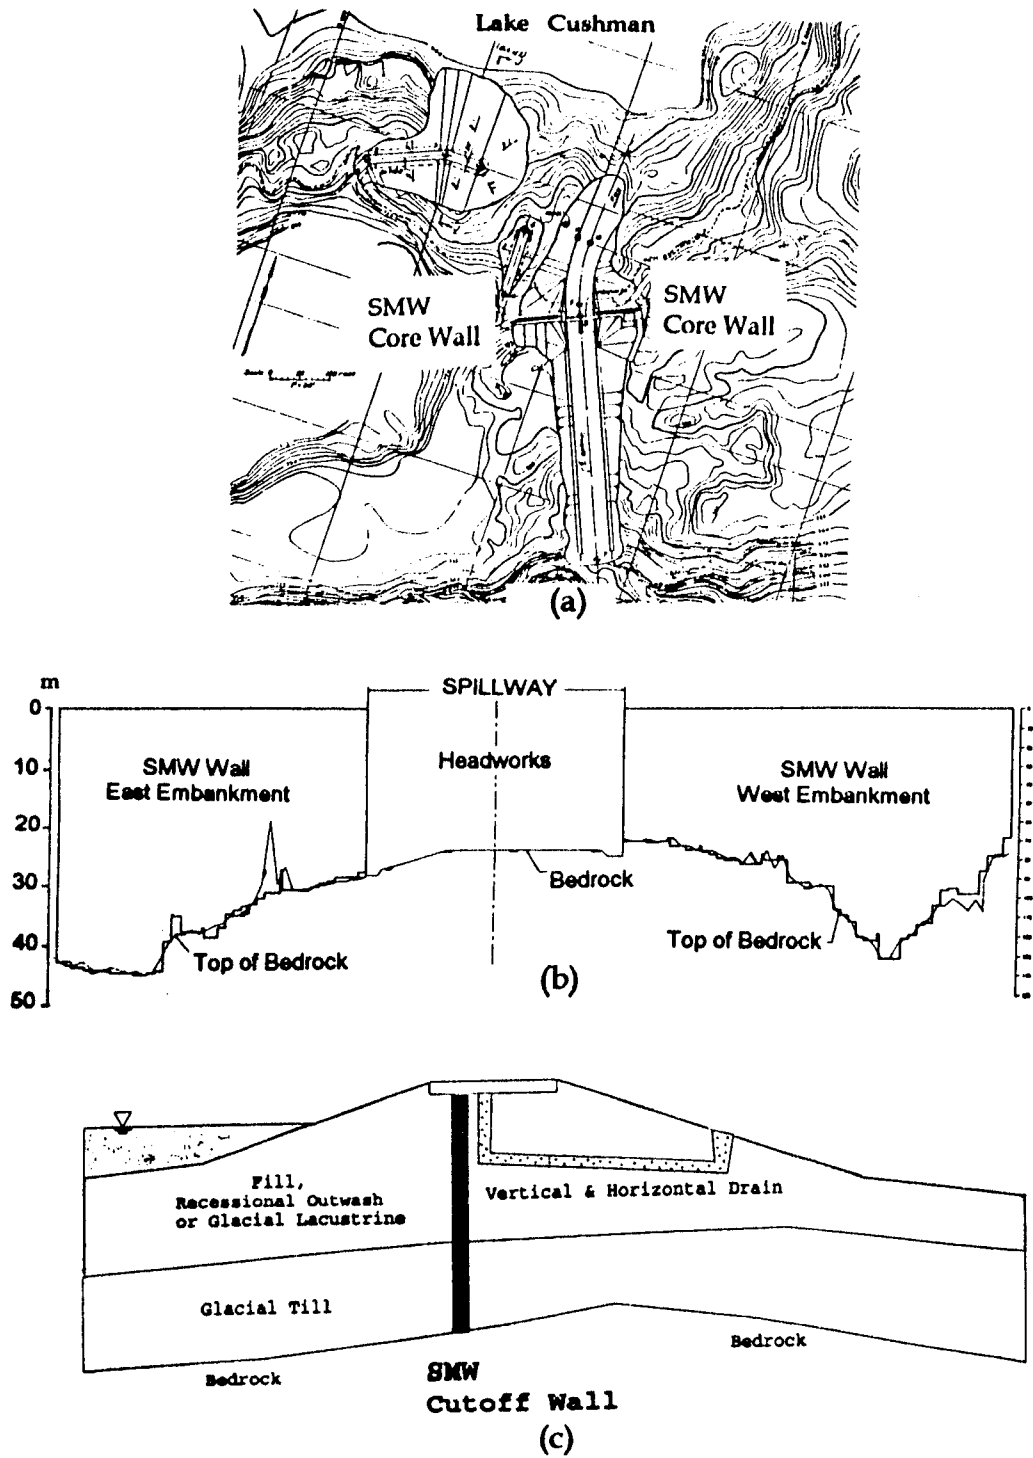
Cushman Spillway Project, WA a) site plan, b) cut-off wall profile, and c) simplified general cross section of embankment (Yang and Takeshima, 1994).
